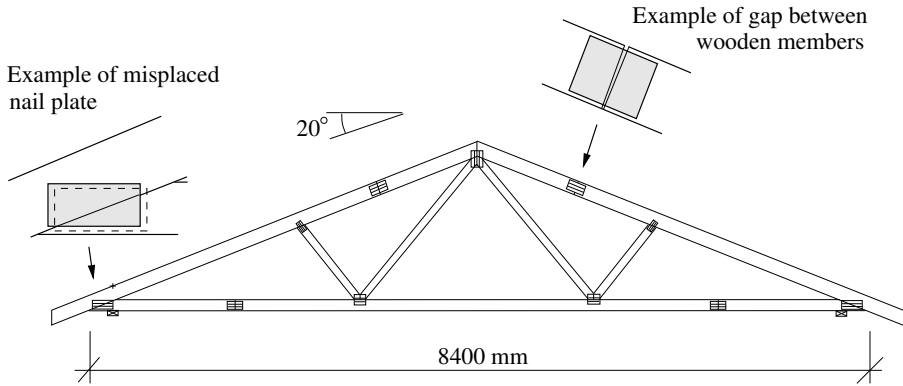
W-truss with nail-plate joints showing an example of a gap between two wooden members and a misplaced nail plate.
